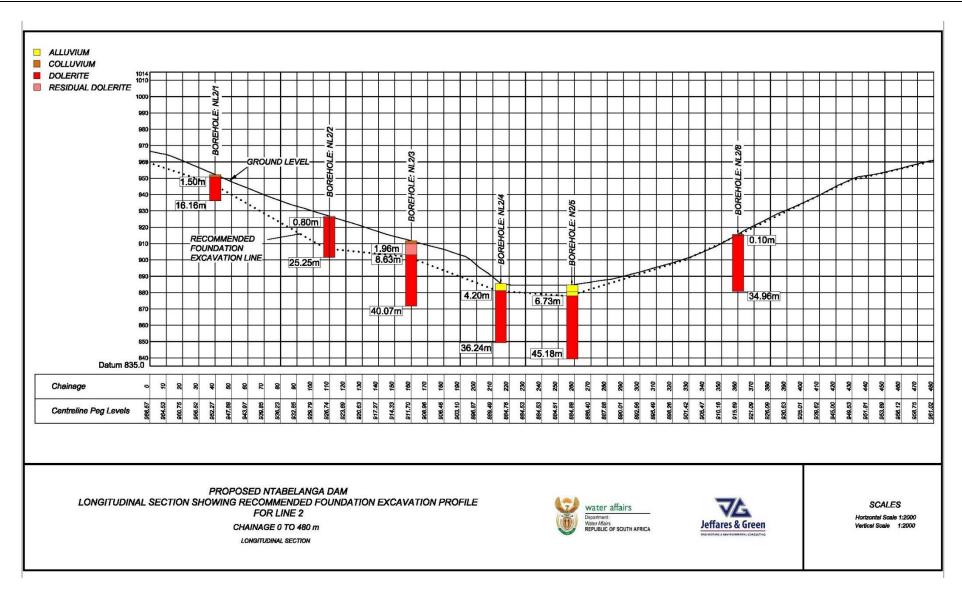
Longitudinal Section - Alignment 2 – Showing Interpretation of Core Drilling Logs
